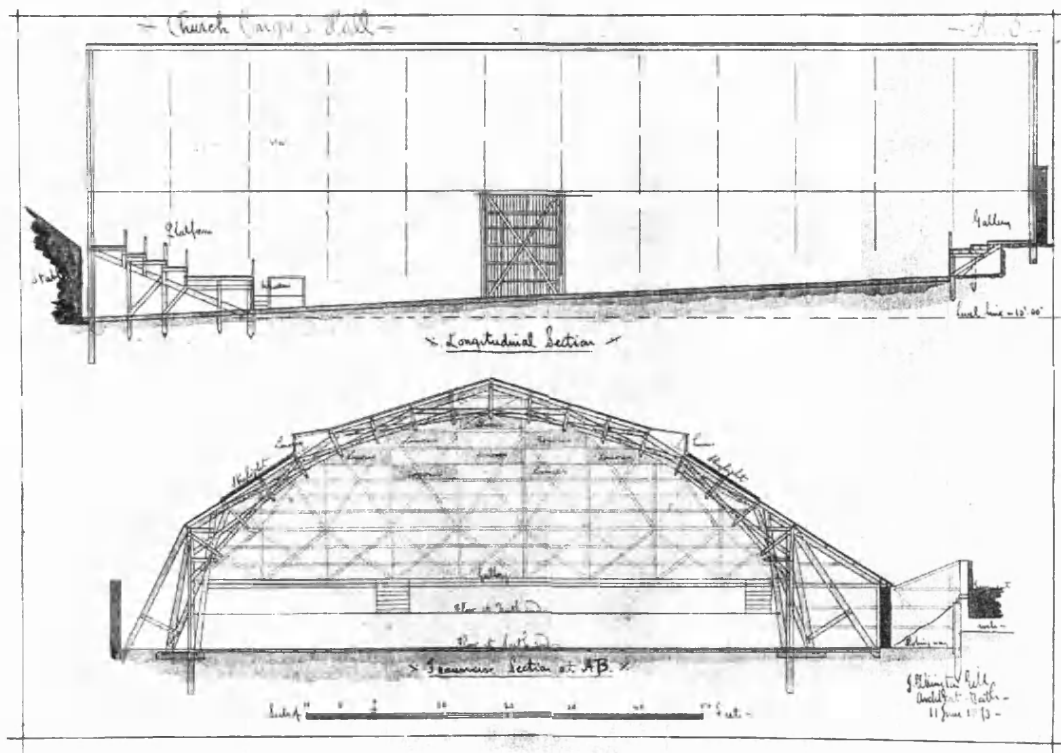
Proposed temporary Church Congress Hall, Julian Road. Drawing signed J Elkington Gill, dated: 11 June 1873.
